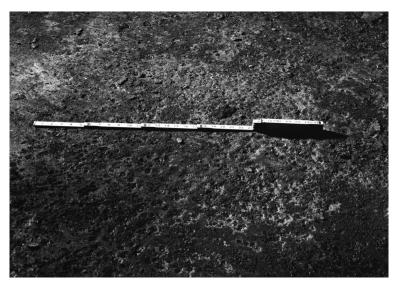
Example of Extensive Corrosion of a Tank Bottom
